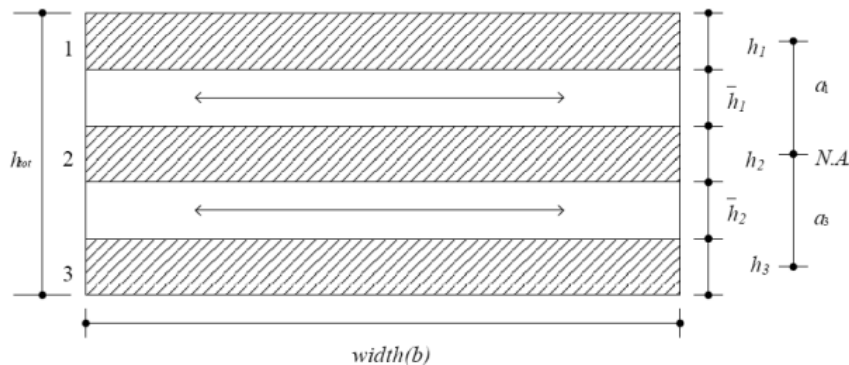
Cross section of CLT element with designations (KLH Massivholz GmbH 2012)
